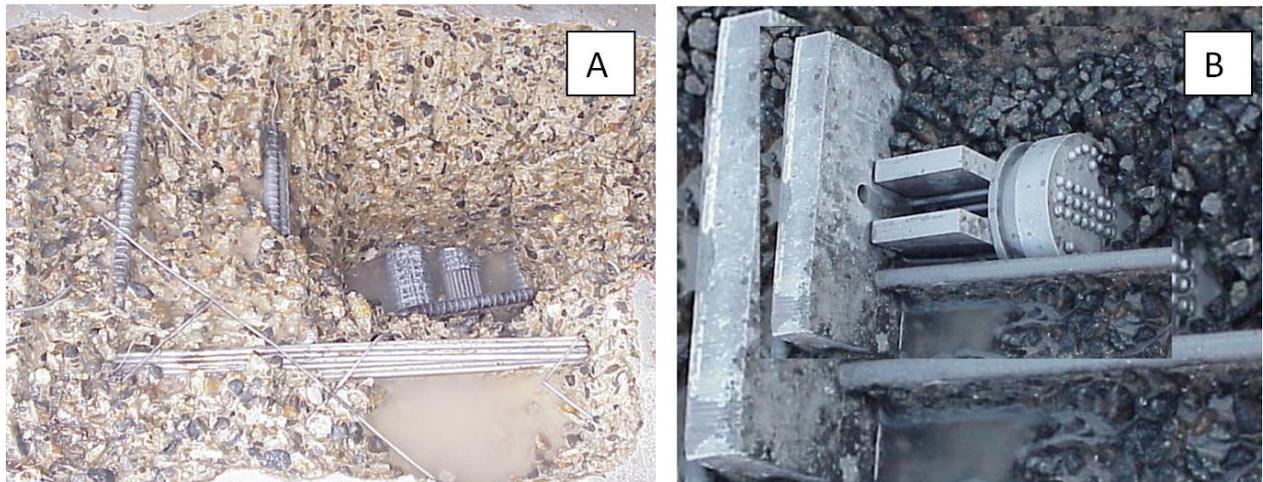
Open Reinforcing (A) and Anchor (B) after Concrete Chipping
